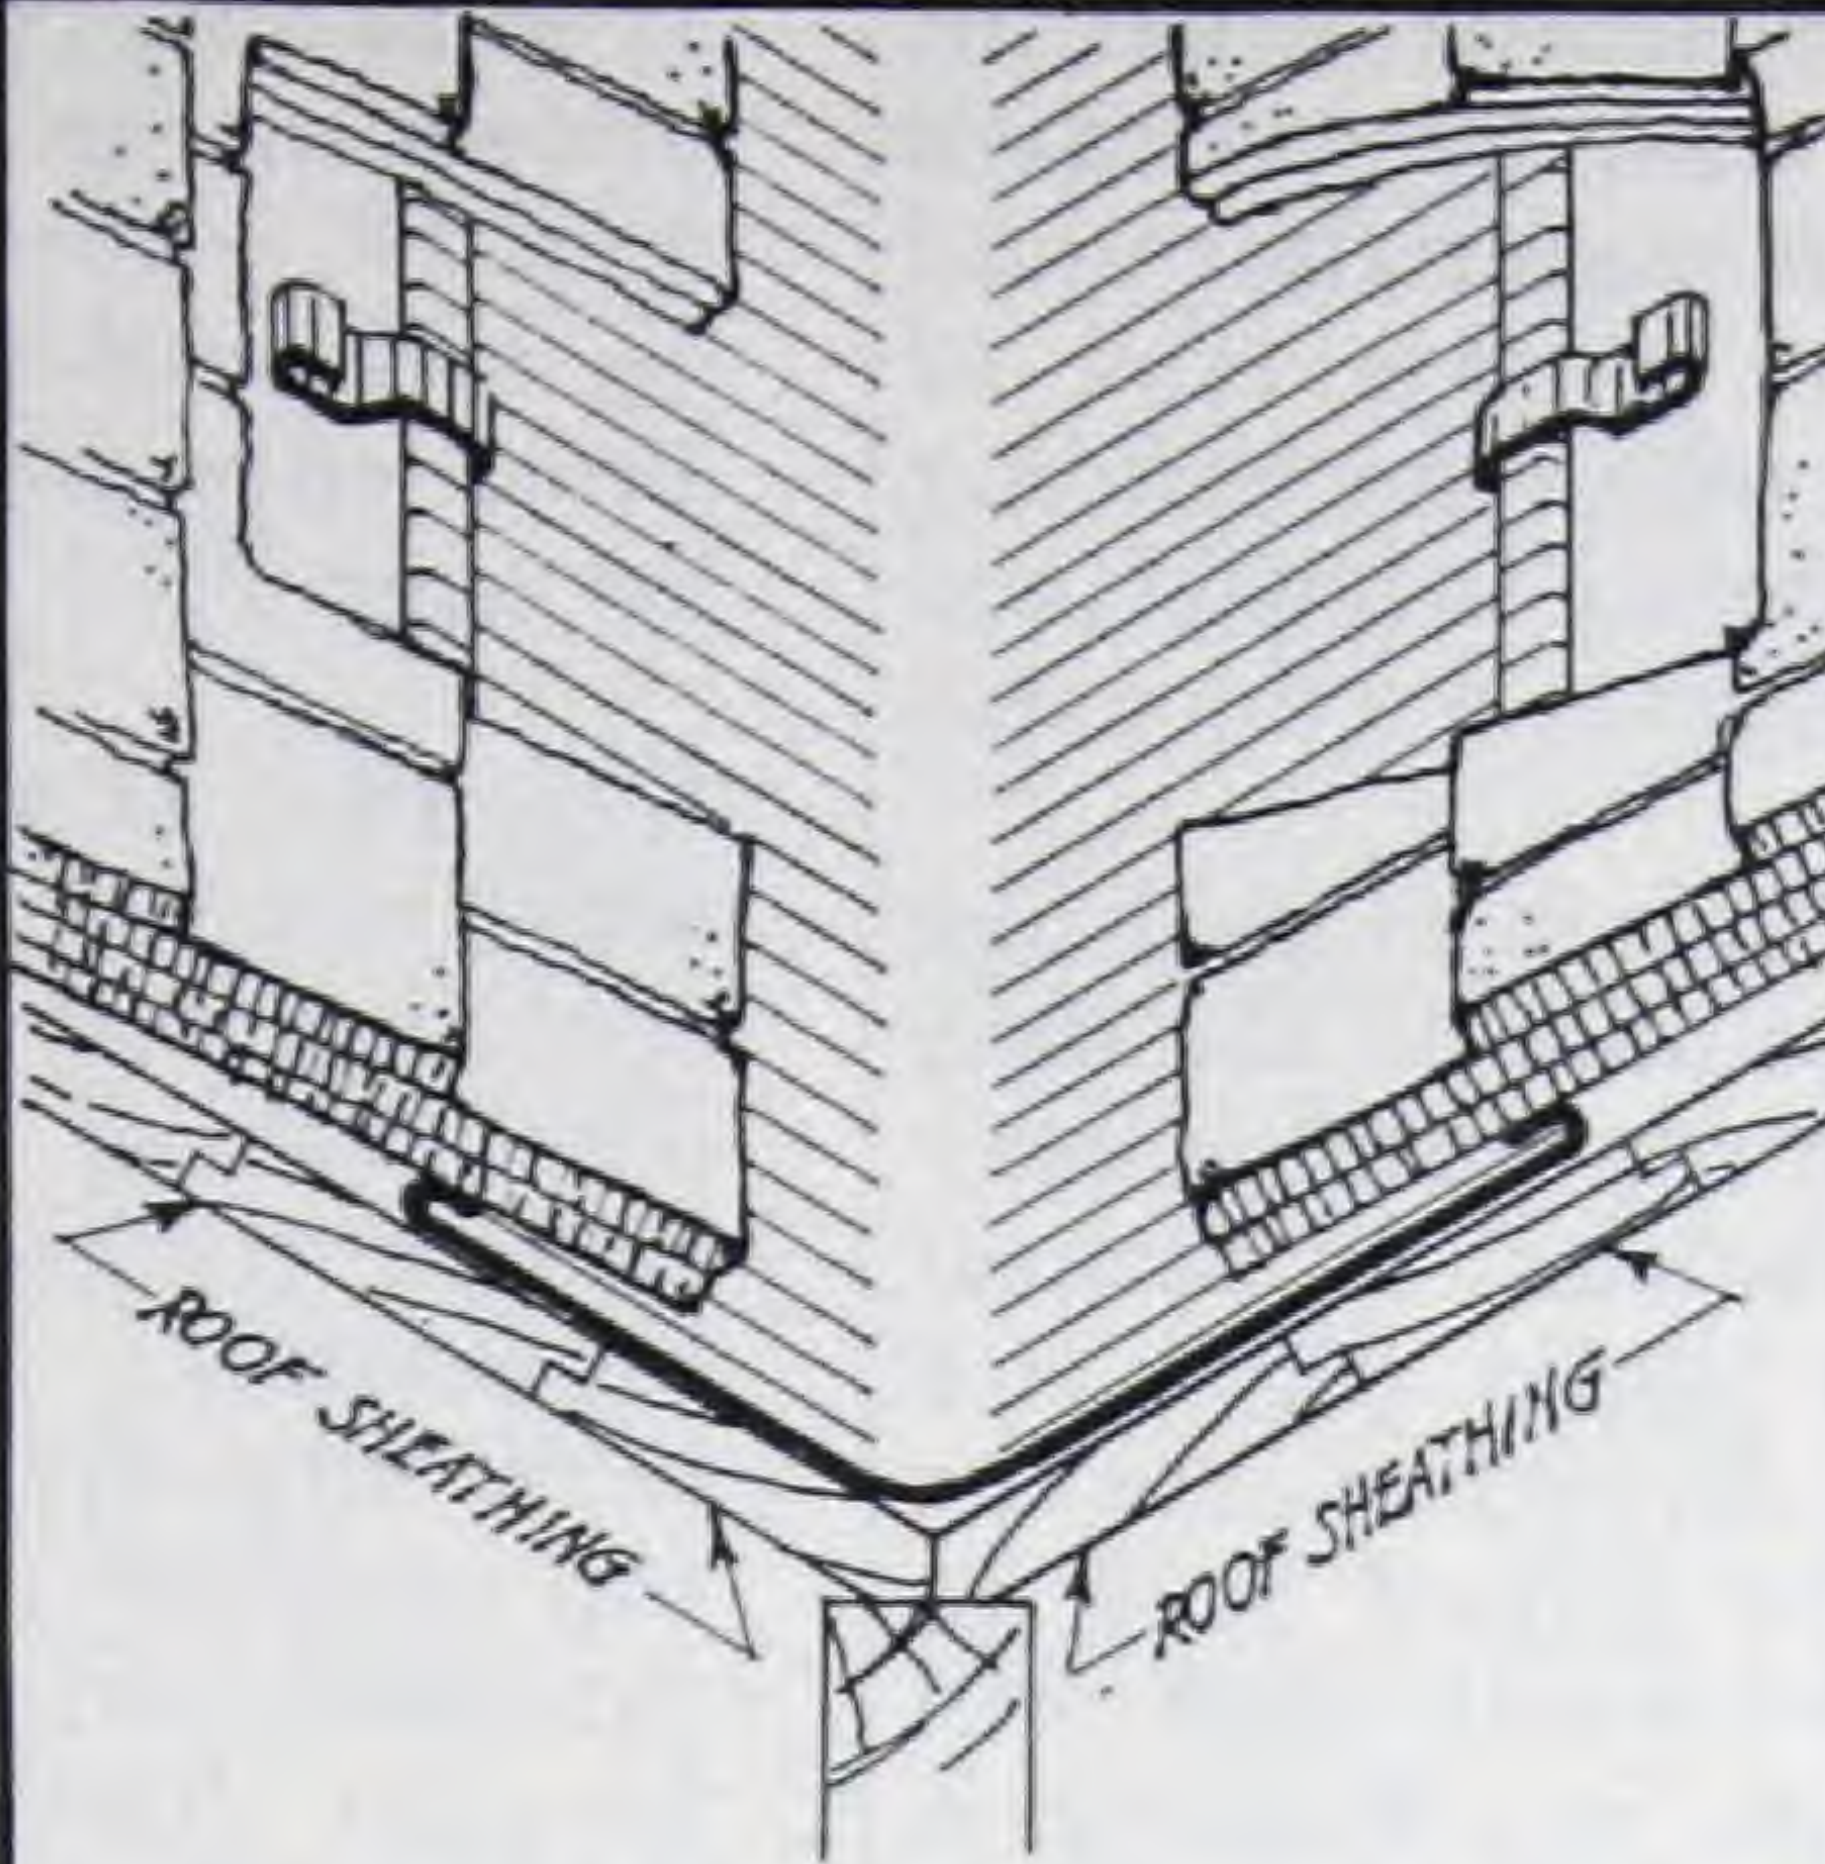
When a shingle roof abuts a shingle wall the copper flashing is arranged as shown in Fig. 13. This flashing should be extended 4 inches out on the roof over the shingles and up on the wall sheathing at least 4 inches and secured along the upper edge by copper nails. Note the $\frac{1}{2}$ -inch "fold-over" of the lower edge.
